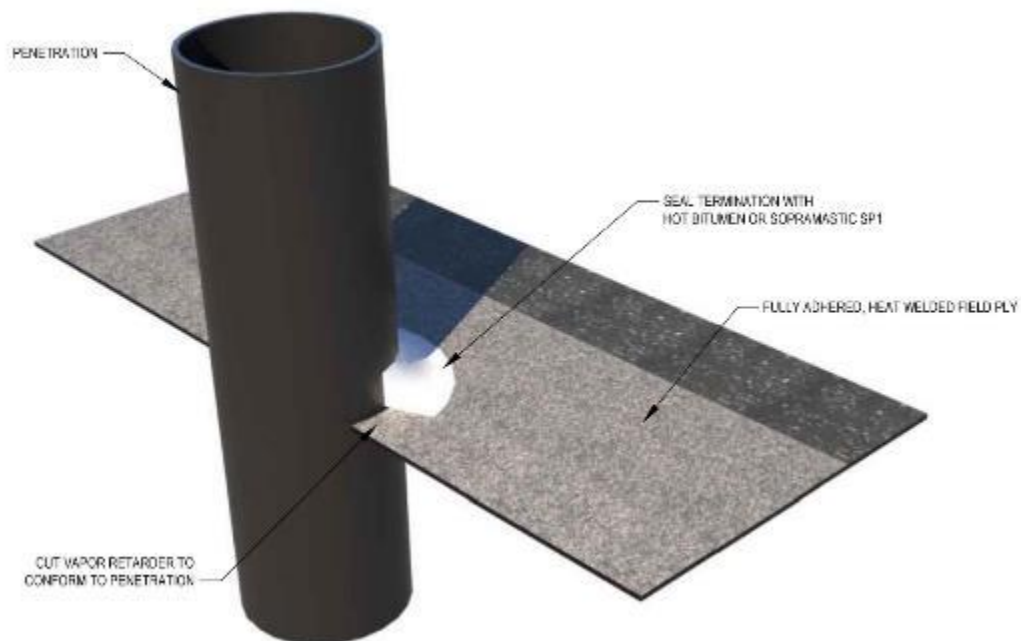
Fully Adhered, Heat Welded Vapor Retarder at Penetration
